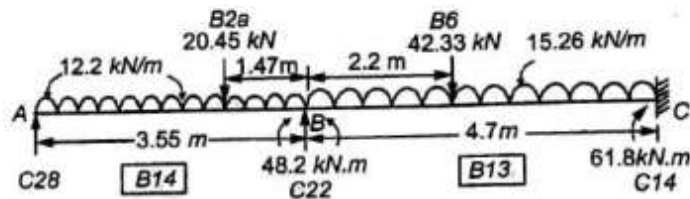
Loading for calculation of Shear - Beam B14-B13
